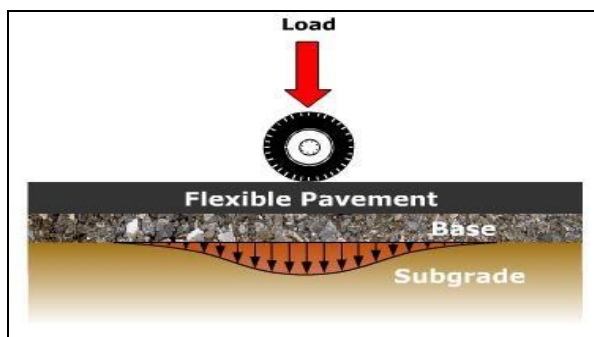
FLEXIBLE PAVEMENT LOAD DISTRIBUTION
